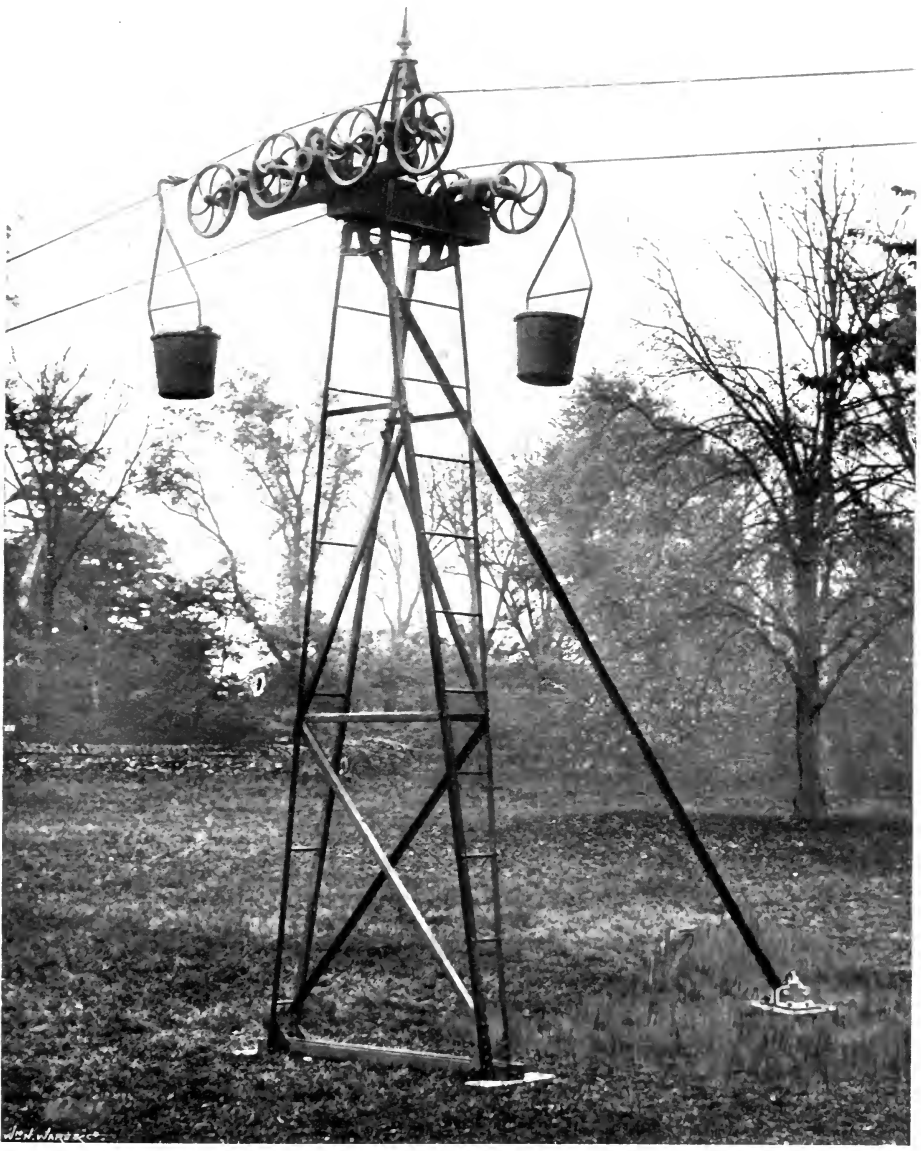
VIEW OF LIGHT STEEL TRESTLE. SHOWING BALANCE SHEAVE GROUPING FOR DISTRIBUTING ROPE PRESSURE.
